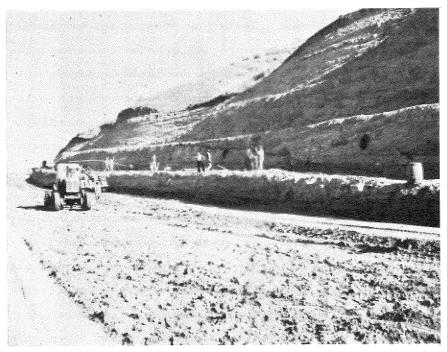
Slide area in east abutment looking northeasterly. Men shown are drilling horizontal drain holes into the abutment below the slide. Sloping dark line above men is clay slip-bed.
